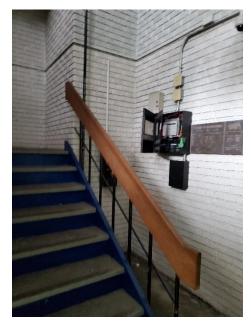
View of the stairs at the front of the building leading to the viewing area on the second floor.
